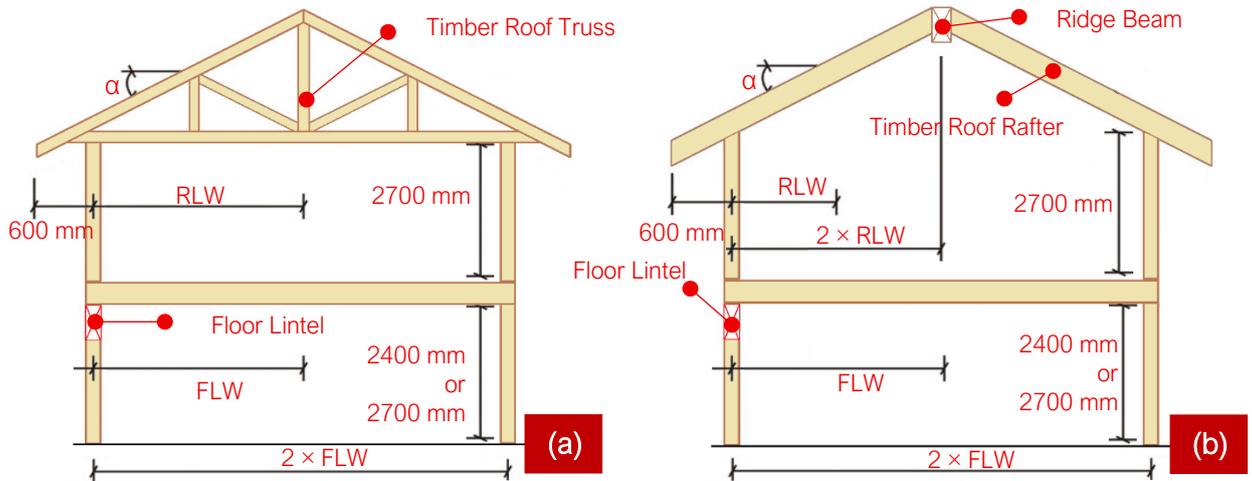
Red Stag Vertix₂₀ floor lintel beam; a) Timber roof truss, b) Timber roof rafter.
